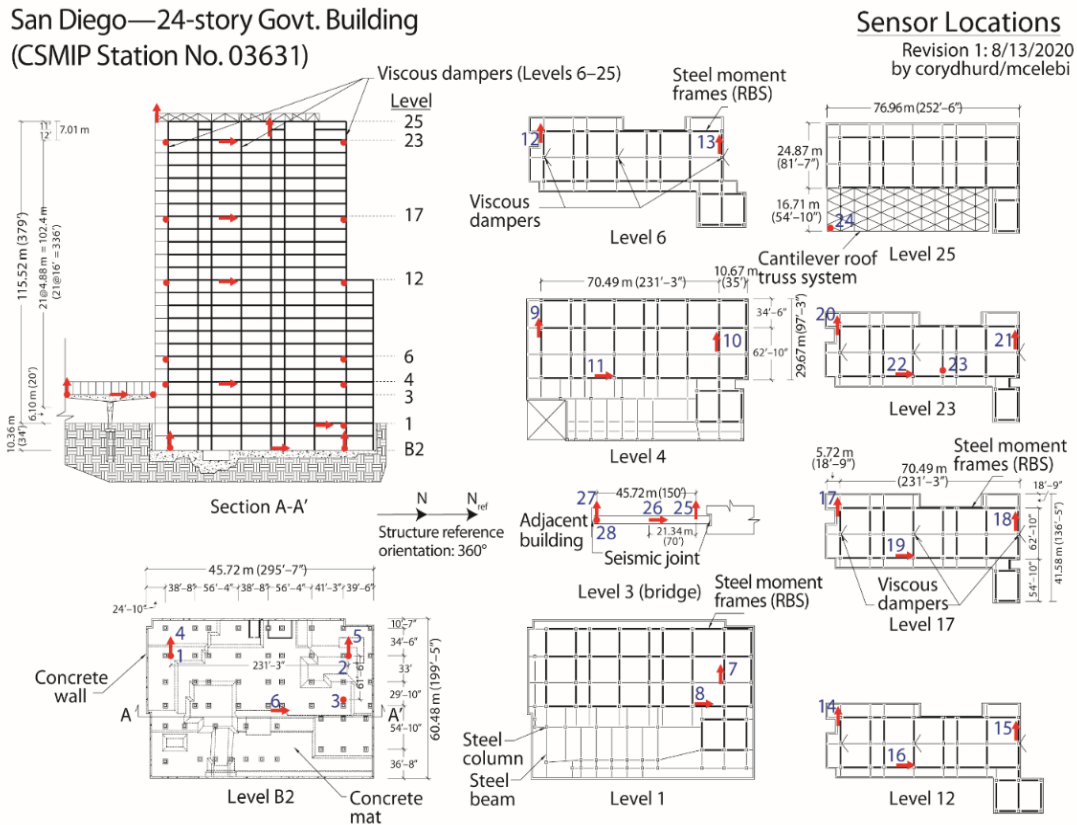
Instrumented vertical section and plan views that show dimensions, as well as arrows and dots depicting locations and orientations of accelerometers deployed throughout the building (as well as a walkway bridge separated by seismic joint. Adapted from: www.strongmotioncenter.org (last accessed March 26, 2021).
